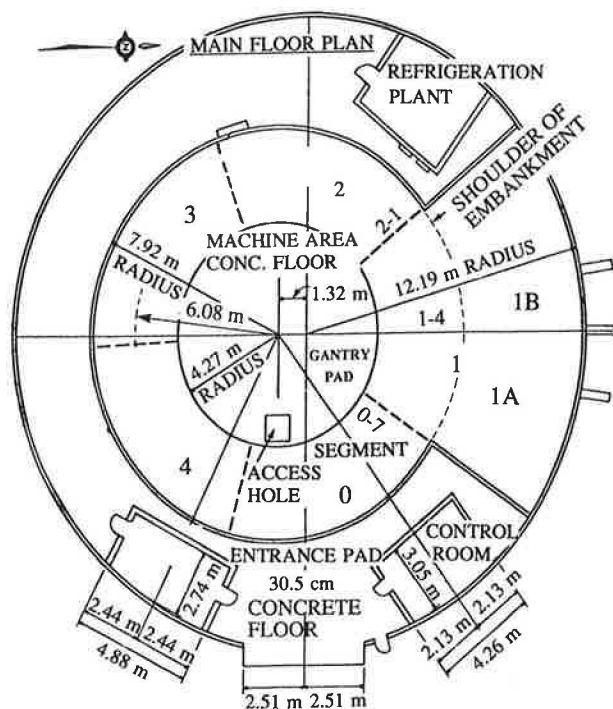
Plan of Saskatchewan Department of Highways and Transportation test track facility.
